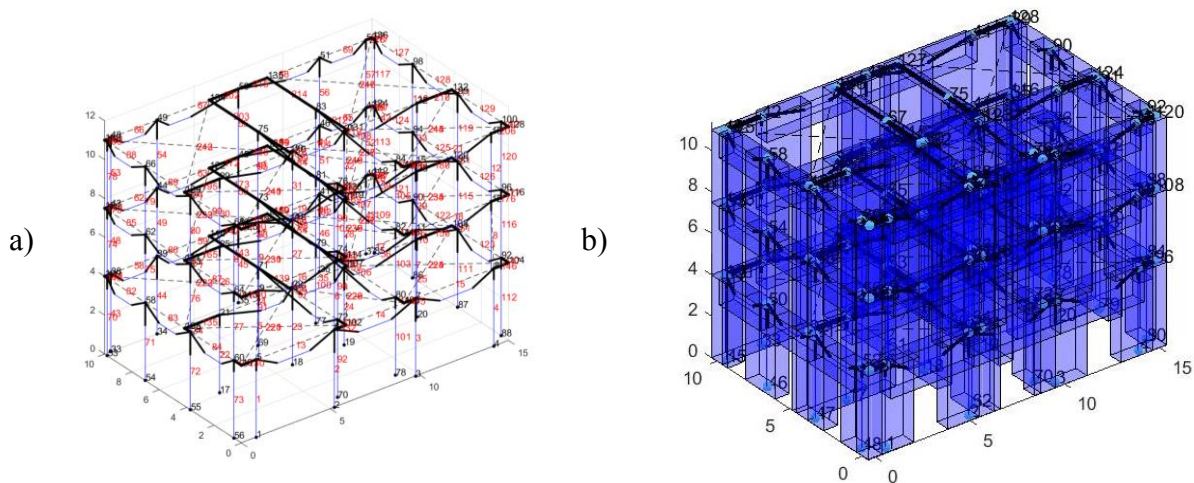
Structural system of archetype building: (a) equivalent frame view; (b) solid view.
